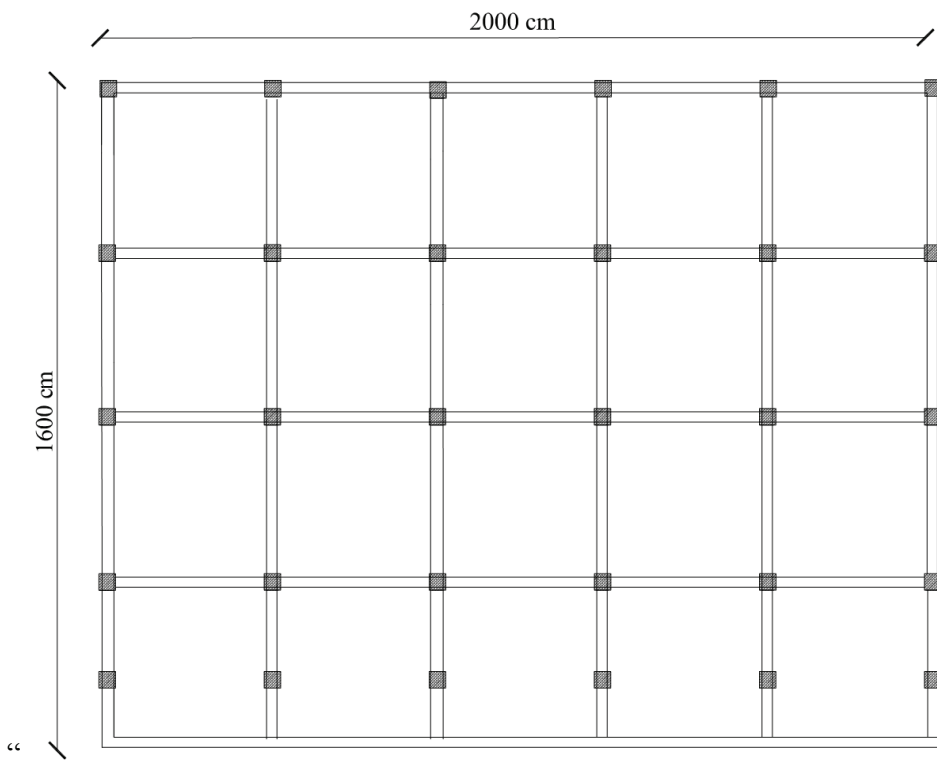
Floor plan of structure B ($T=0.55$ sec, $GDF=0.2$)
